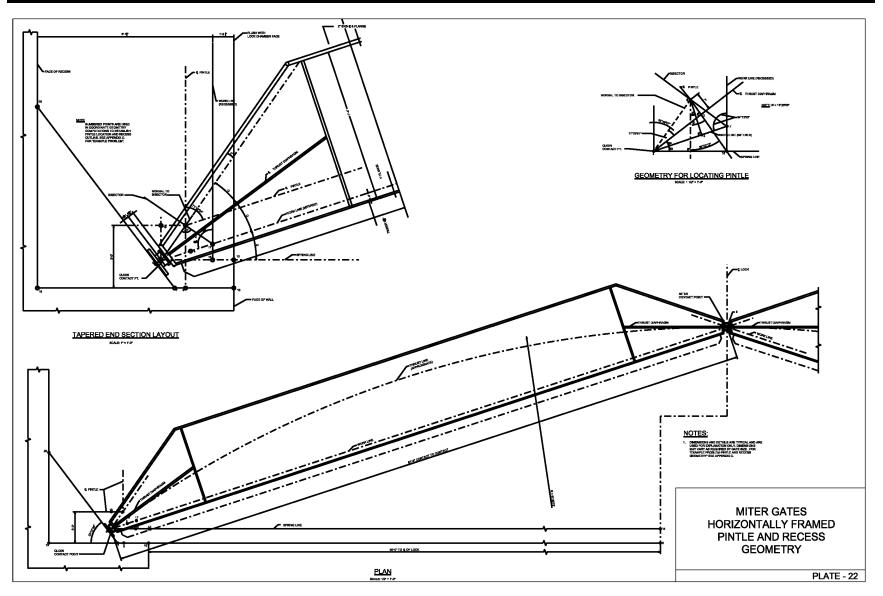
Plate 22: Miter gates, horizontally framed, pintle and recess geometry
